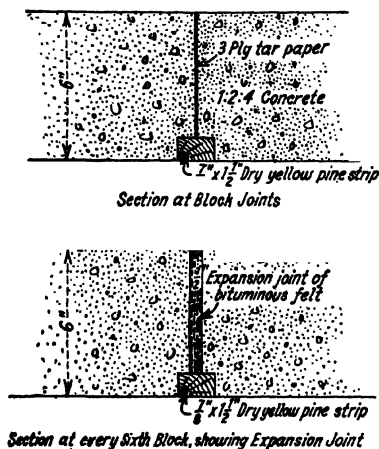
Showing Method of Obtaining Watertightness between Adjacent Blocks of Concrete Canal Lining.
